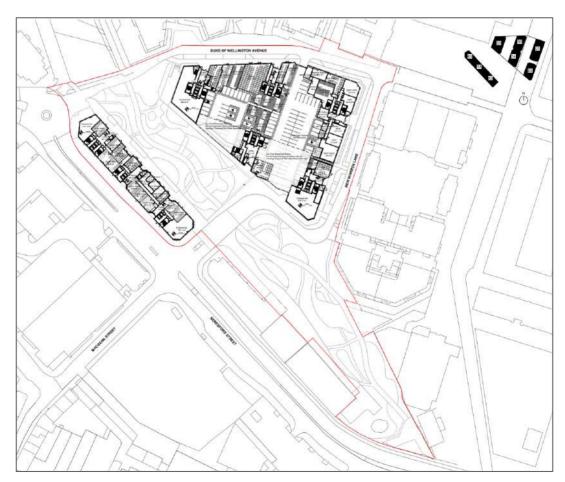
Proposed Sitewide Ground Floor Plan (PRP, February 2024)
